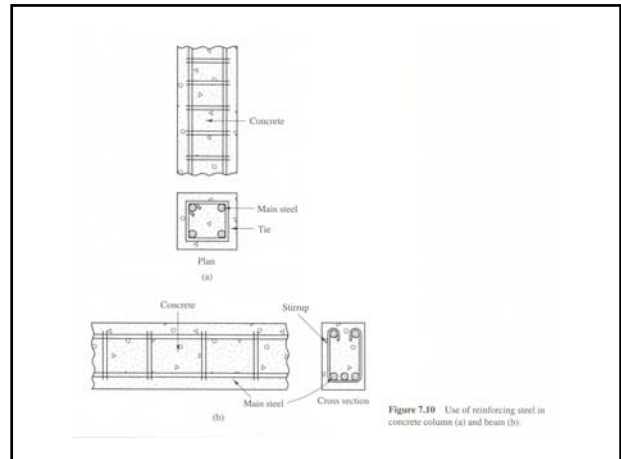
Use of reinforcing steel in concrete column (a) and beam (b).
